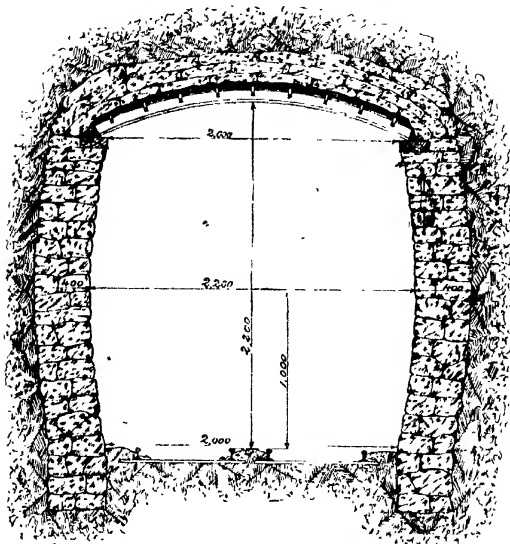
Wide roadway with lining of dry walling, steel beams and rods.
